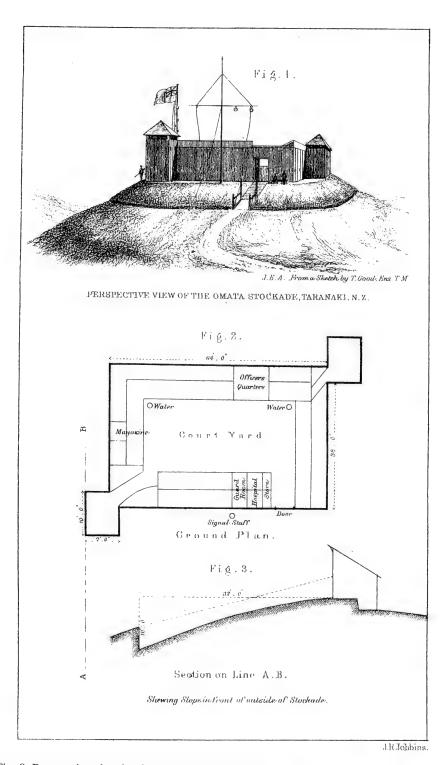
Perspective sketch, plan and section of the Omata Stockade (Alexander 1863a).
